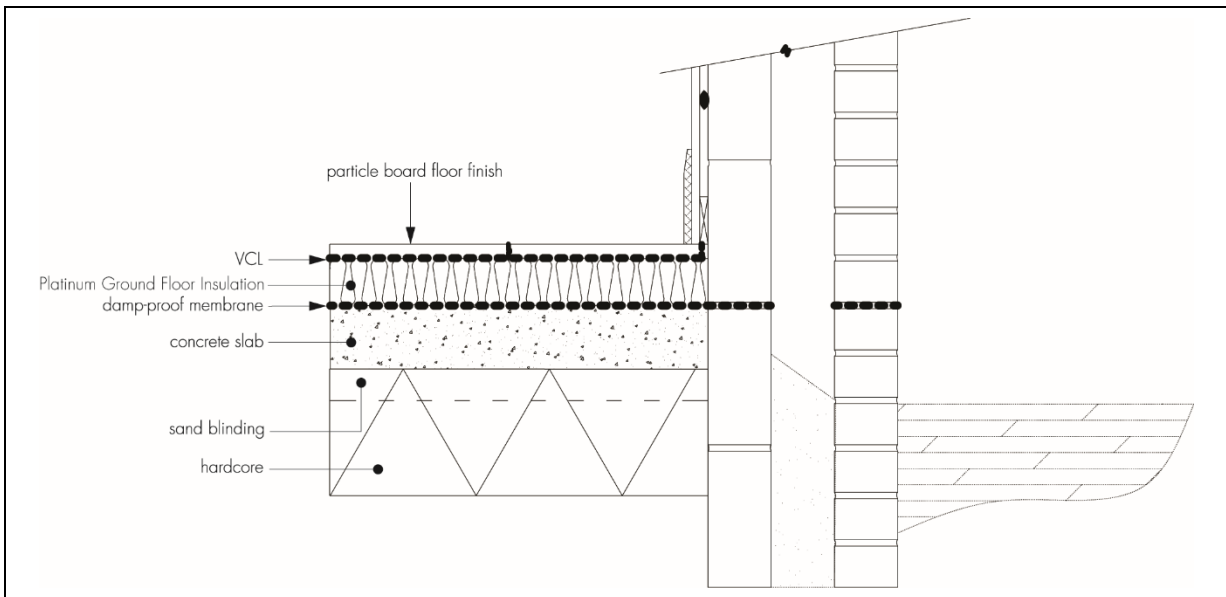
Typical installation details – particle board (dpm over concrete slab)
